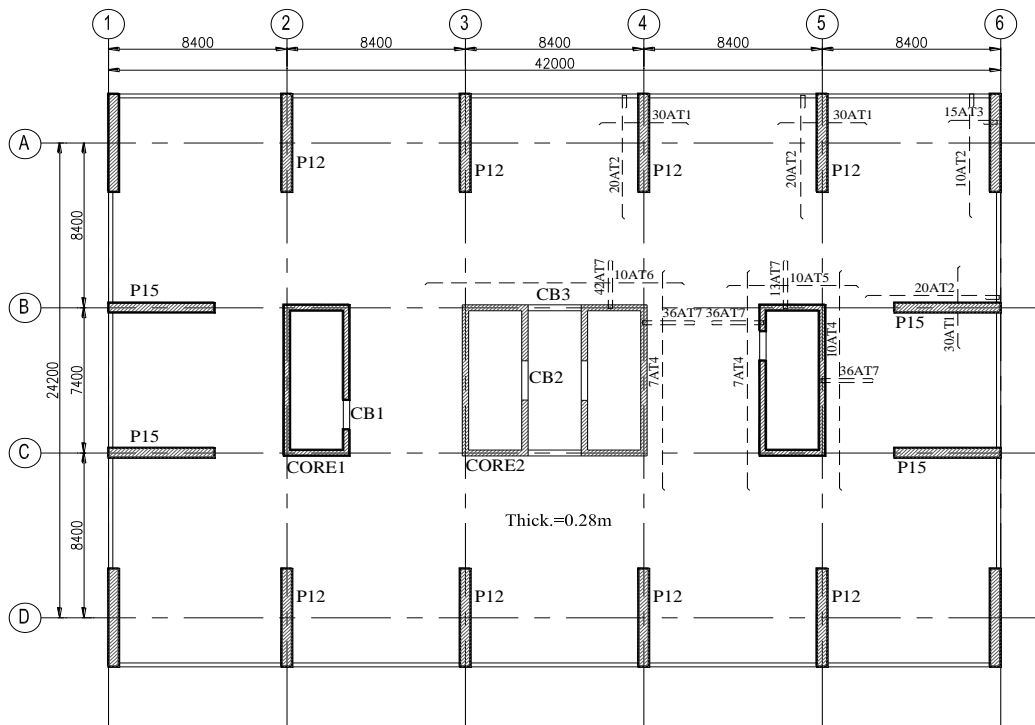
Typical reinforcement details for the floor slabs of the 40-story buildings
